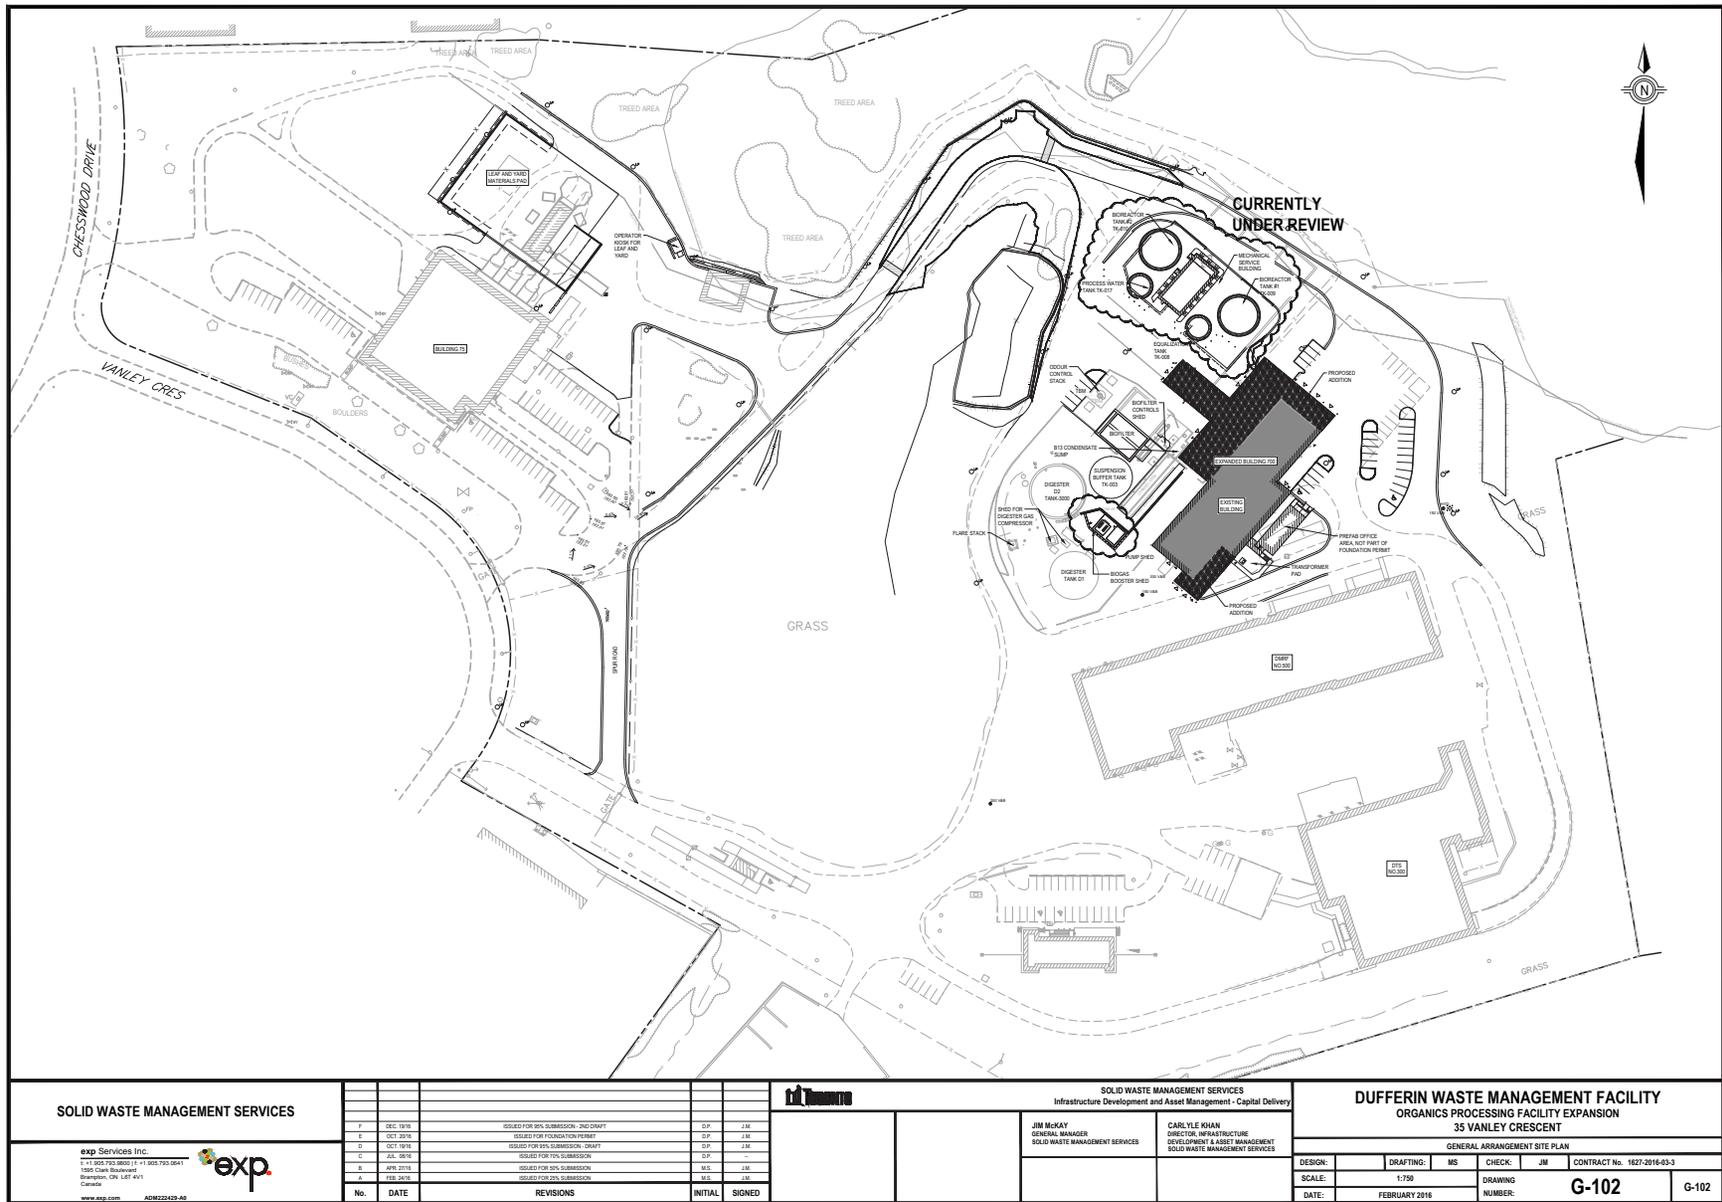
Proposed Site Plan. Source City of Toronto.
